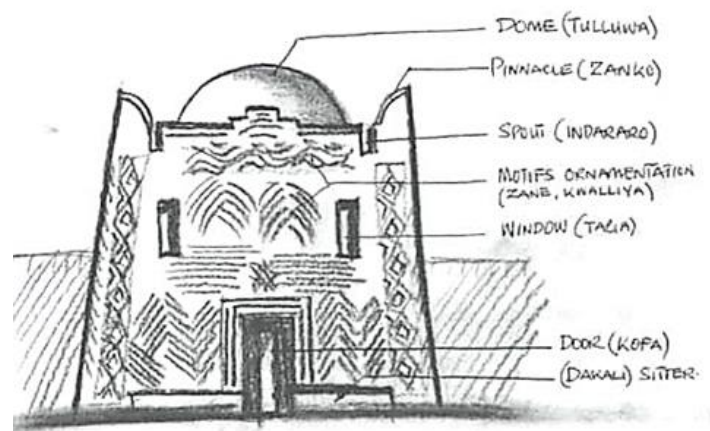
Typical Traditional Hausa House showing Decorative Façade, Pinnacle and Roof Dome.
